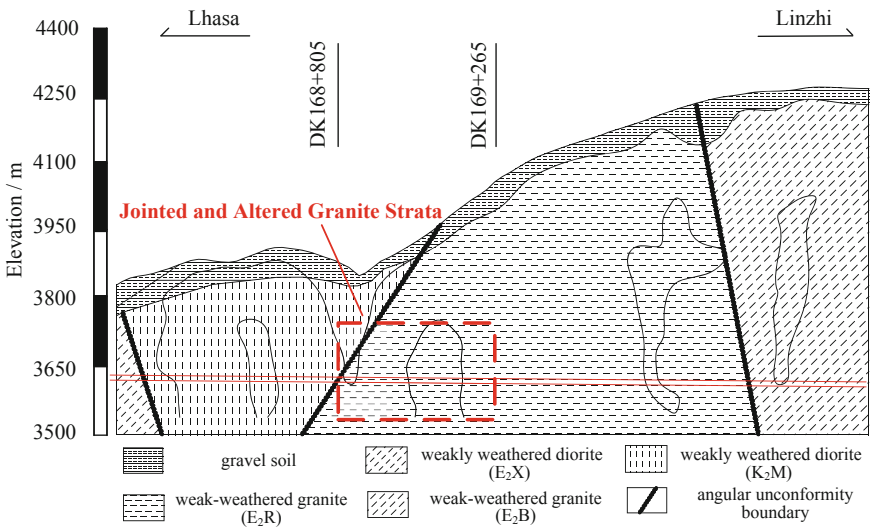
A longitudinal section of a typical section in Zangga tunnel area
